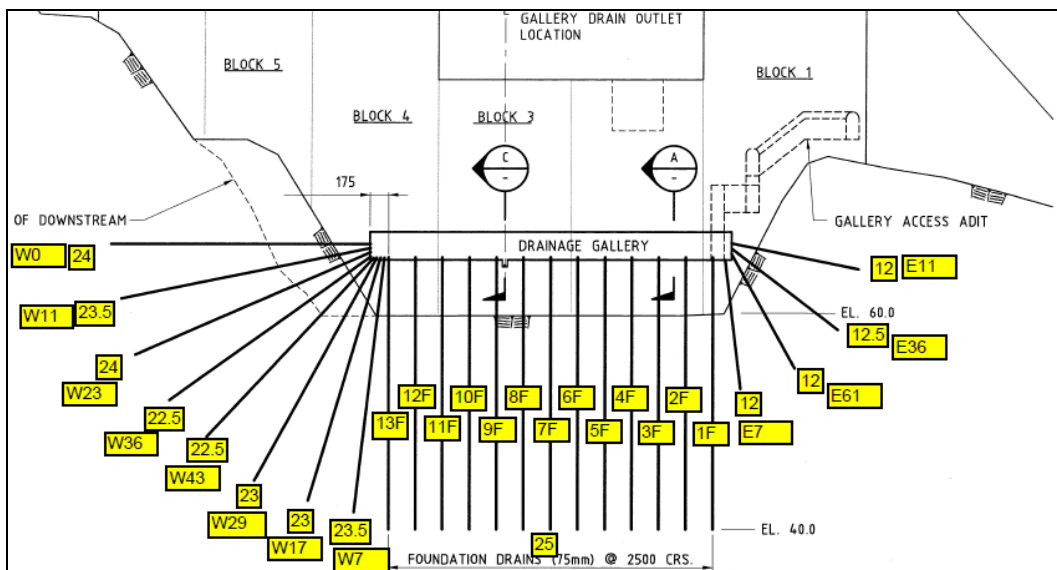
Drainage Gallery Elevation showing Hole Depths and Numbering System
